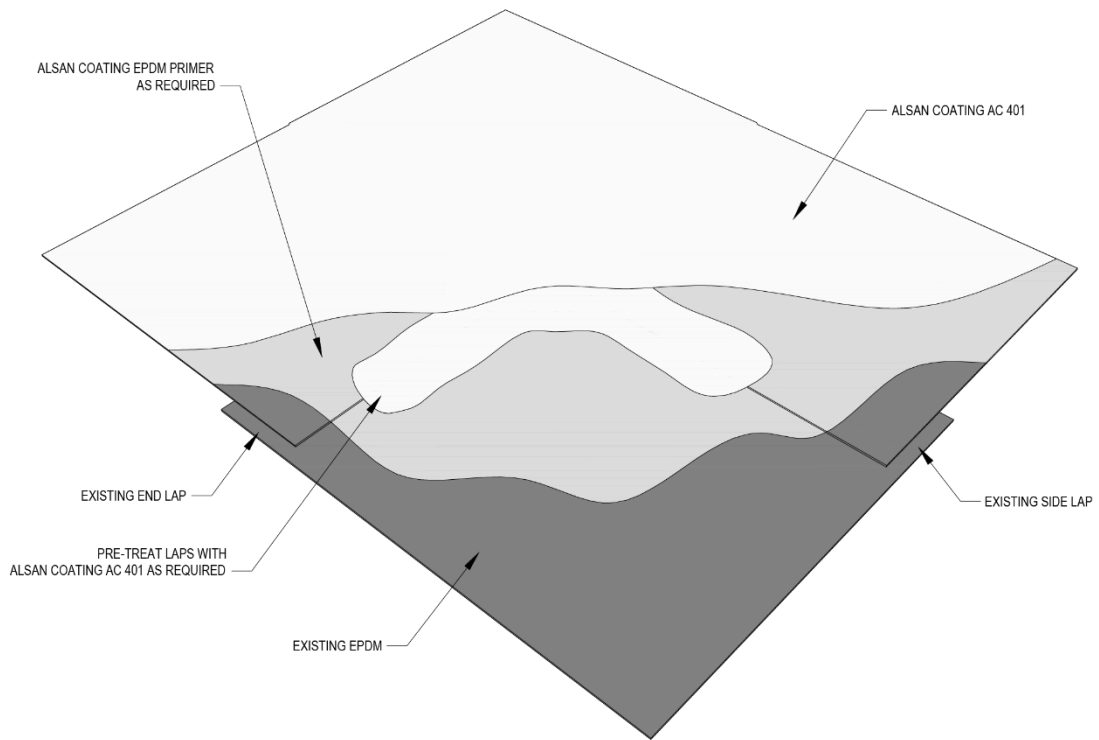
Acrylic Roof Coating Over EPDM, Side/End Laps
